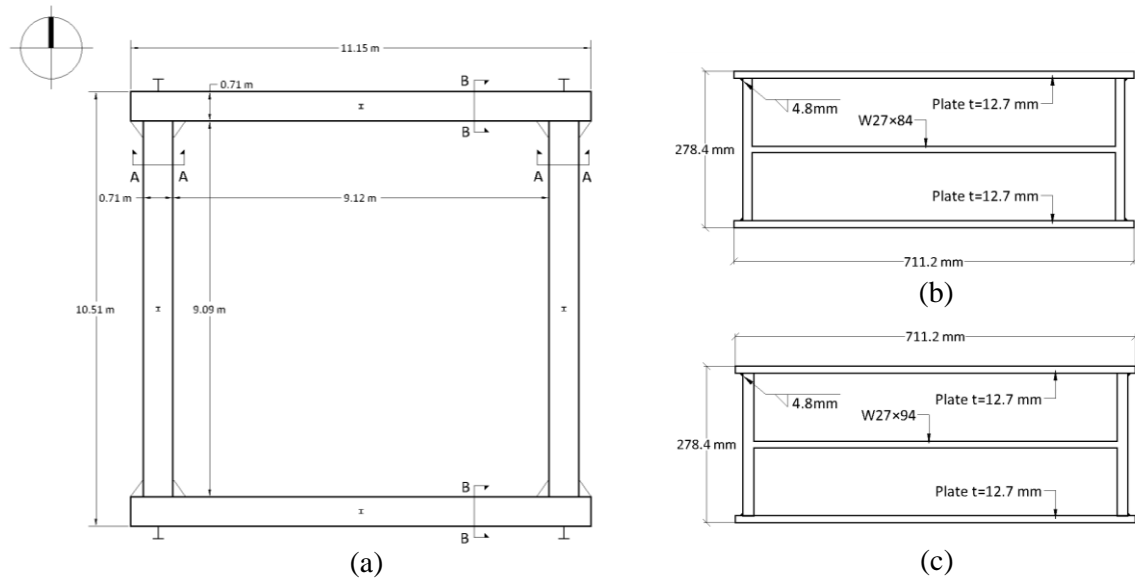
Perimeter beam: (a) Plan view, (b) Section A-A, (c) Section B-B
